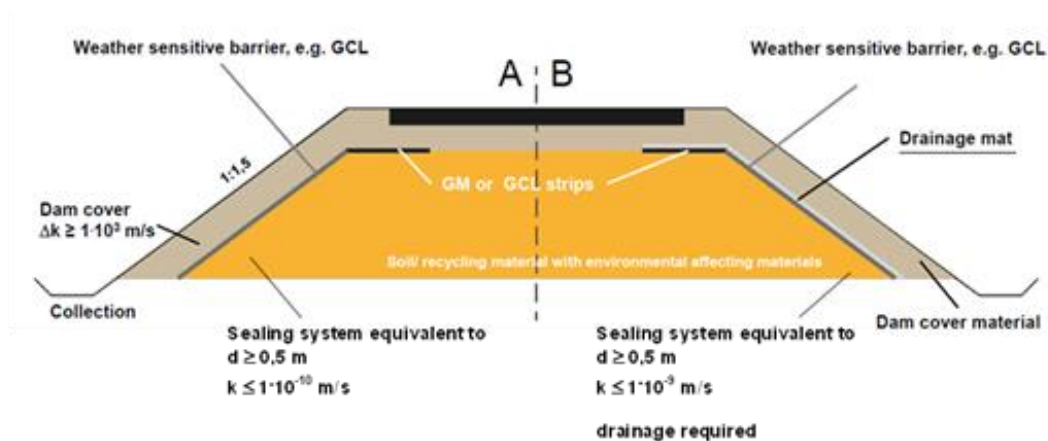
Typical cross section of geosynthetic barrier system for the encapsulation of contaminated soils in road constructions
